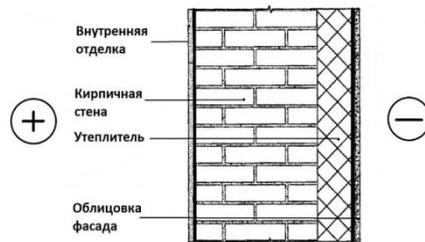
The scheme of the enclosing structure, where: внутренняя отделка - interior decoration, кирпичная стена - Brick wall, утеплитель – insulation, облицовка фасада - facade cladding.
